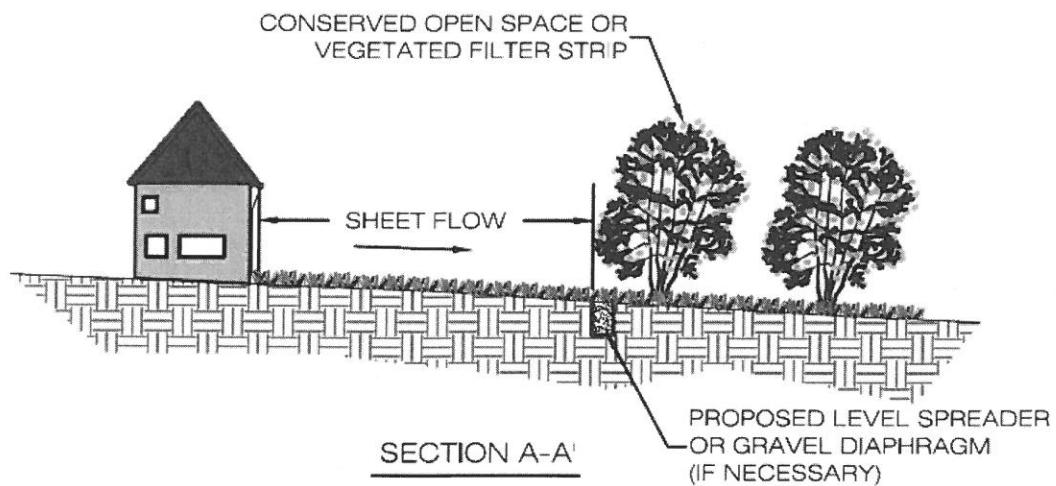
Typical Sheetflow to Conserved Open Space
